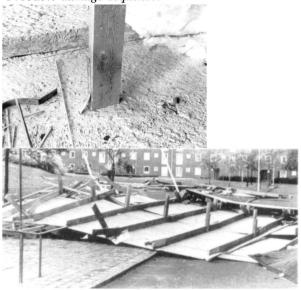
/4 Damage examples. Fixing of post to the roof slab. Note the wrong position of the steel strap (left). Part of the roof is lying on the leeward side of the damaged building (right).
